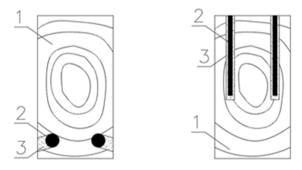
Example of steel strengthening (1 – timber element, 2 – steel elements, 3 – glue system) (own study)
